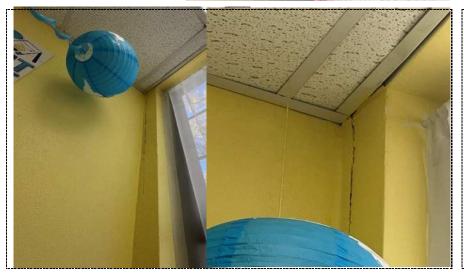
Structural crack in Northwest corner of Art roombuilding 1.
